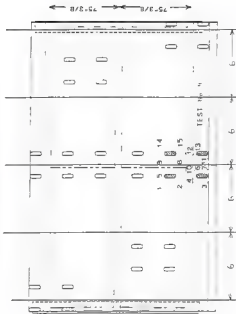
LVDT Locations (Second Bridge - Test No 4)
